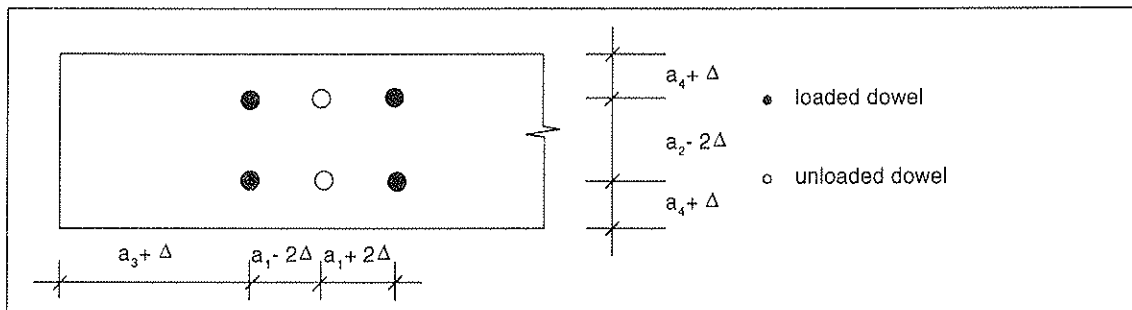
Drilling of the specimen with fabrication tolerances  $\Delta$
